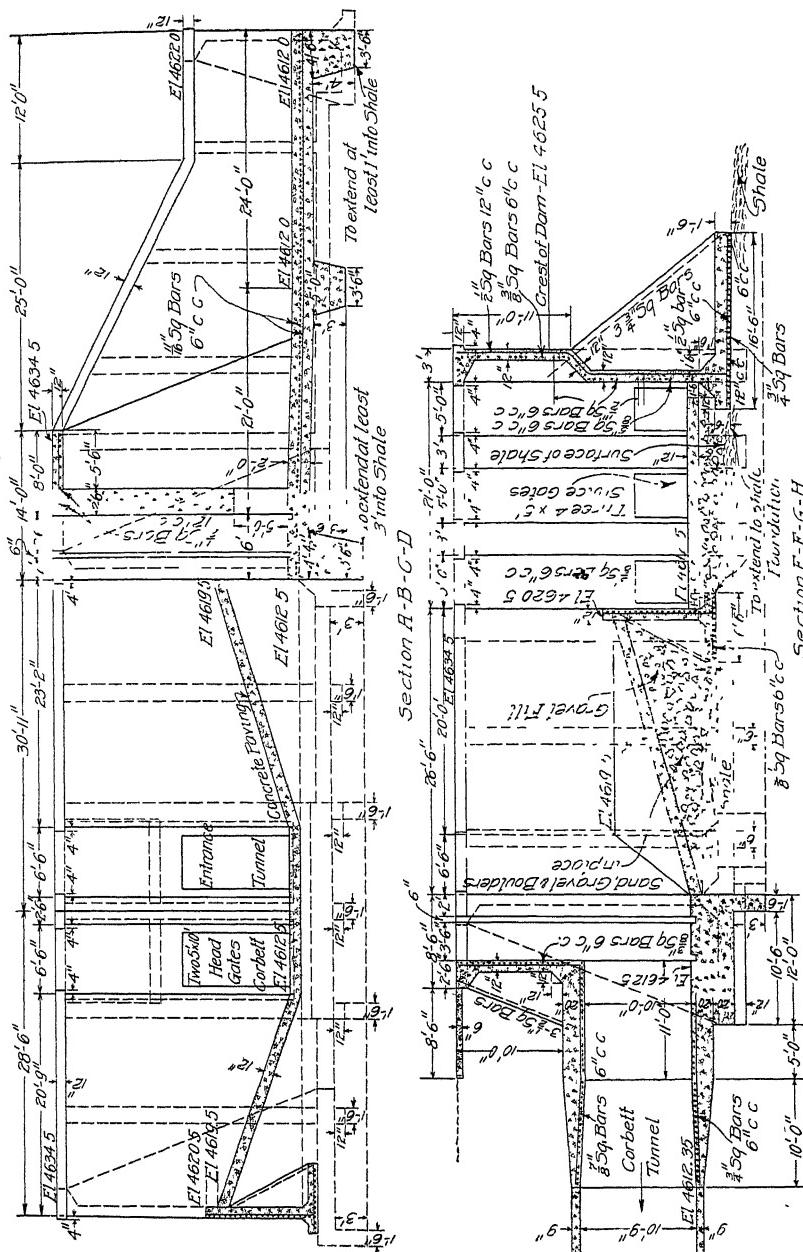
Design Diagrams for West Sluices of Corbett Dam
